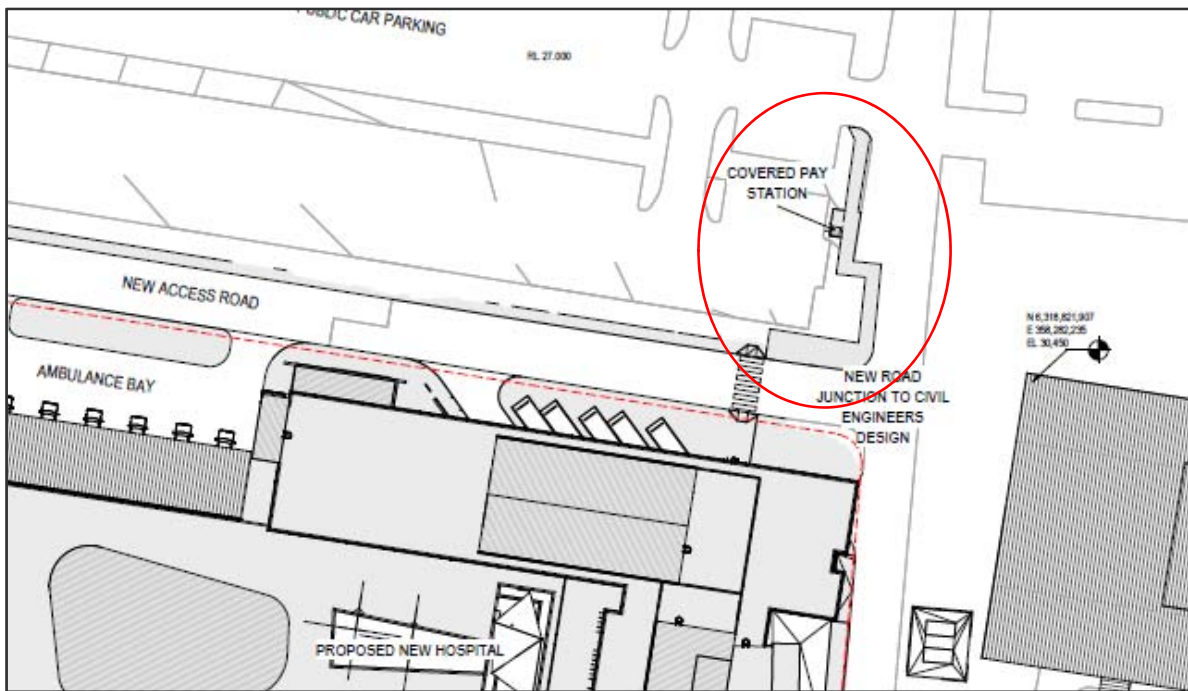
| Location of covered pay station (Source: Applicant’s RtS)
